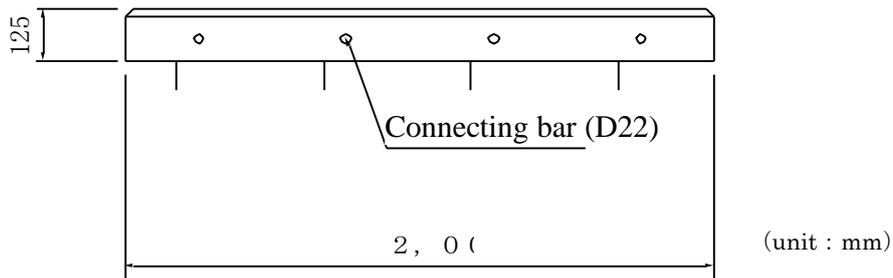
Bottom view of RRR-panel (Standard panel)
